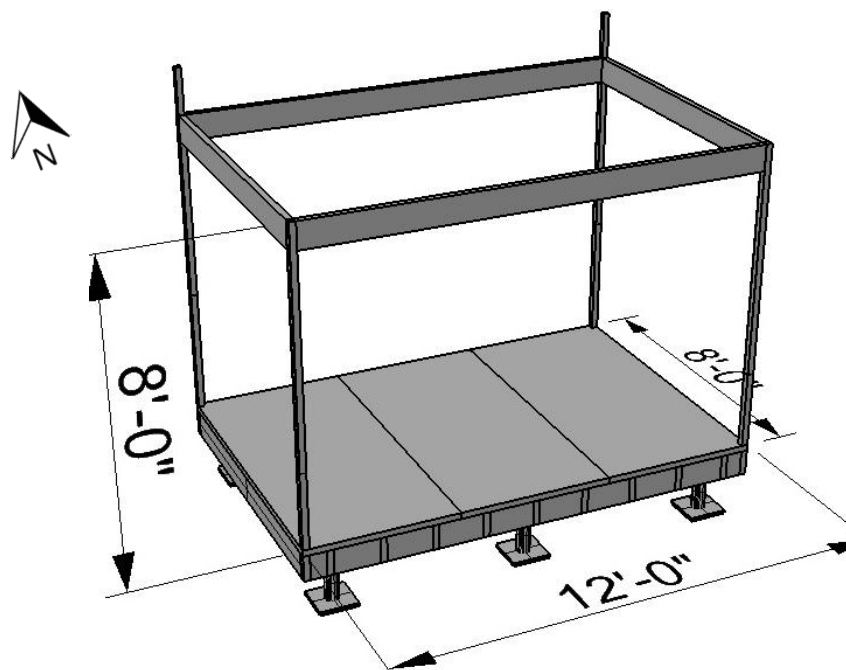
Envisioned framing and adjustable pillars to tilt the roof
